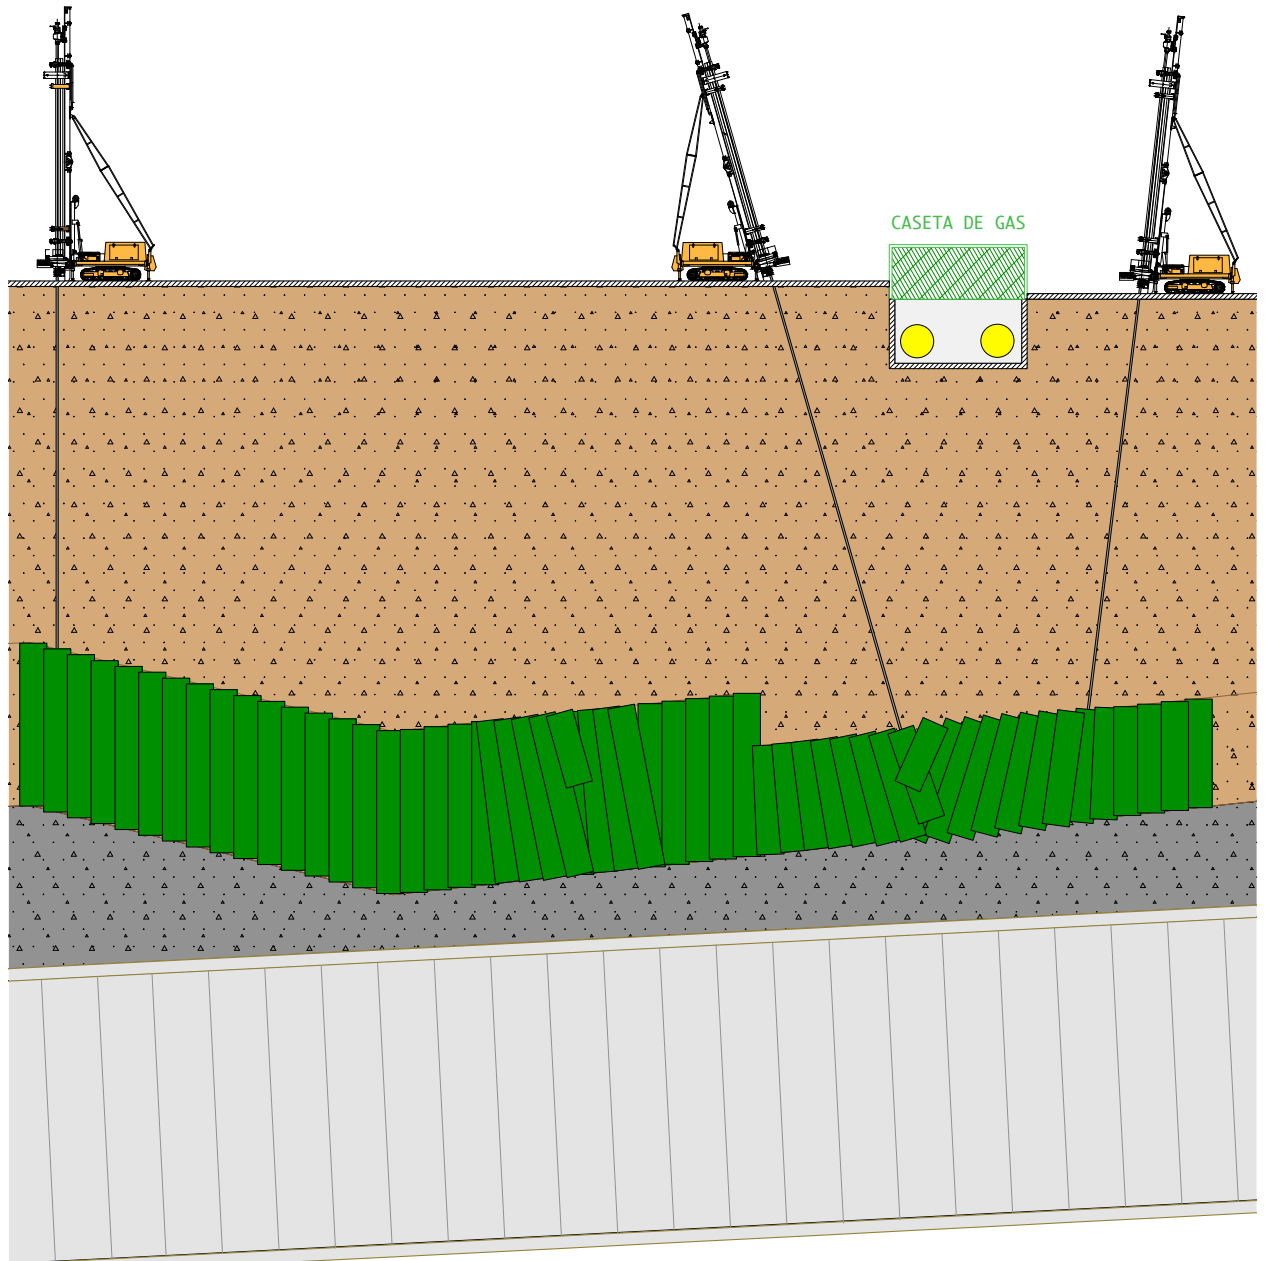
General longitudinal section showing columns' layout and depth at "Caseta de Gas" location
